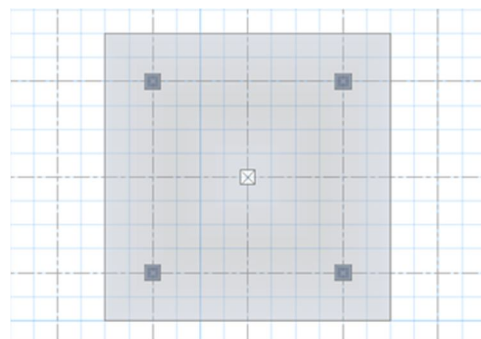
slab without drop - opening of (445mmx 445mm)
